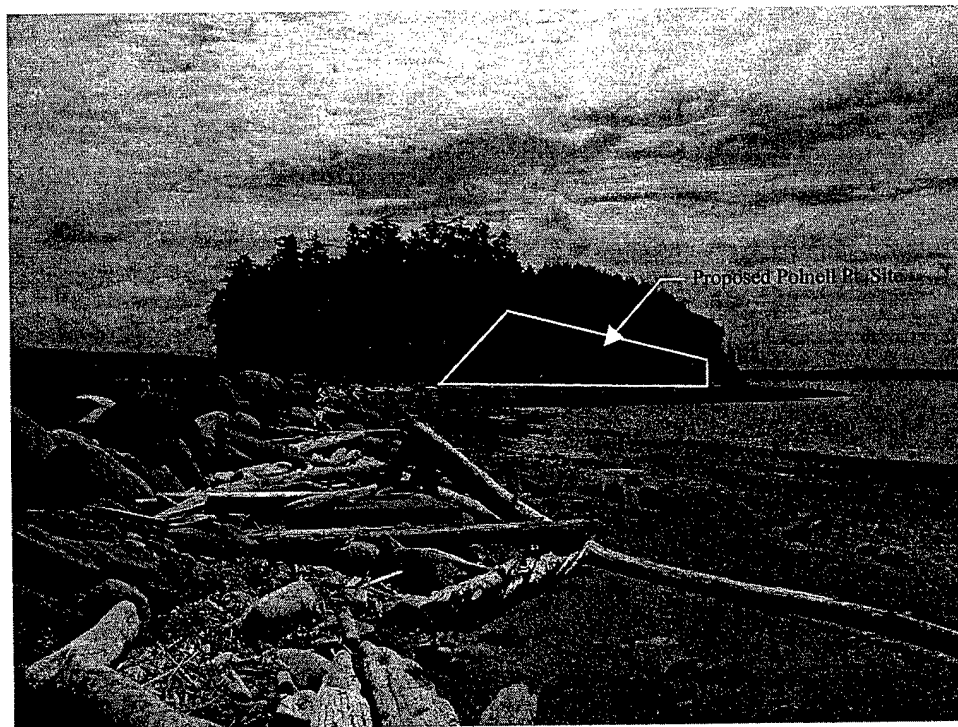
Existing conditions of the Polnell Point Site showing general location of proposed DTR.
